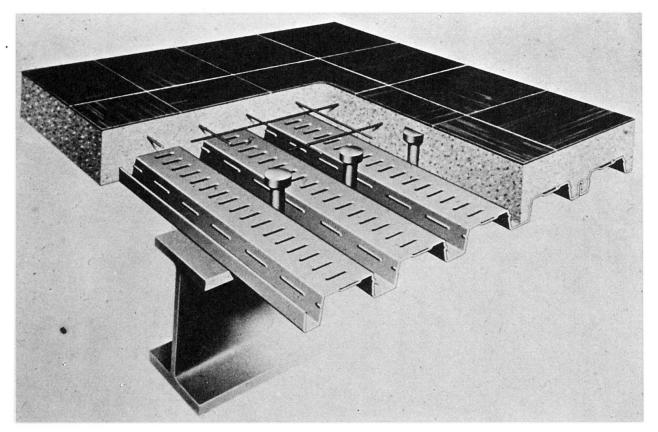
Industrial Building: Combination of Hot-Rolled and Cold-Formed Steel Construction
